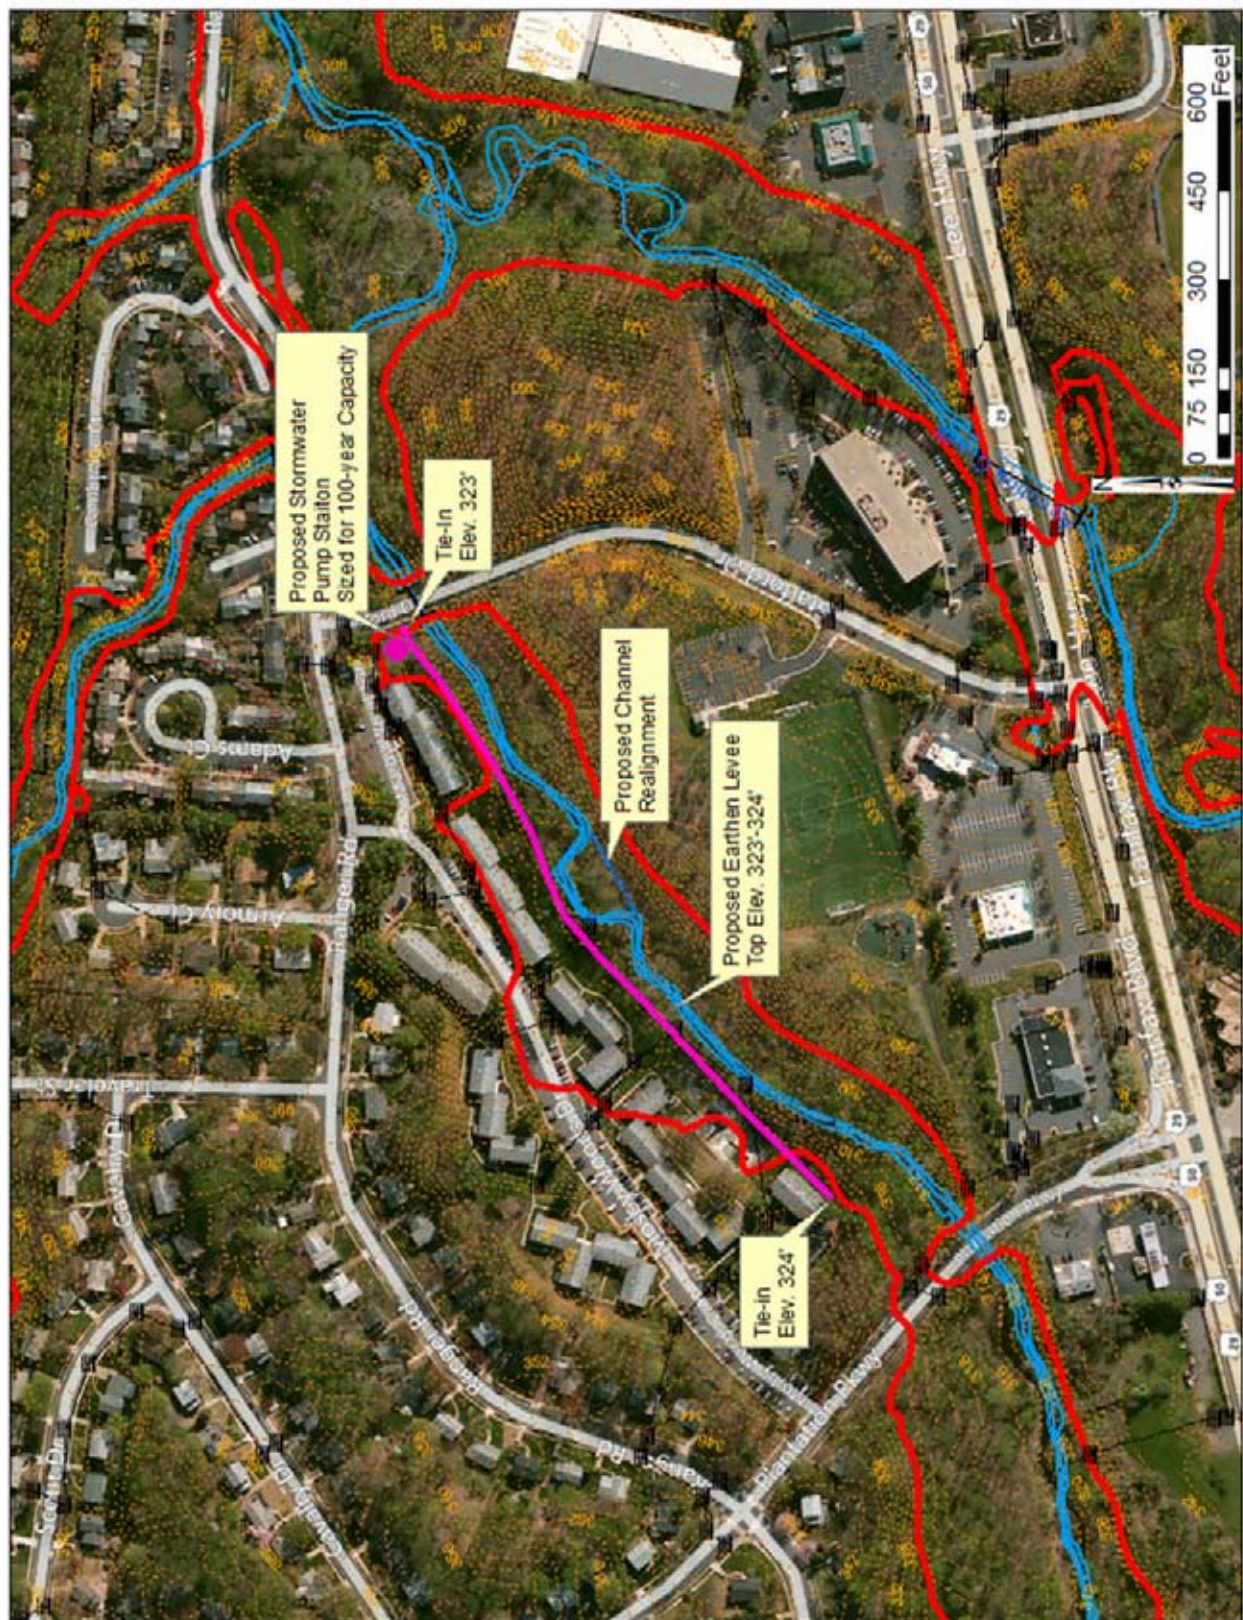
Proposed Conception Plan – Alternative Plan 2 Levee and Pump Station
